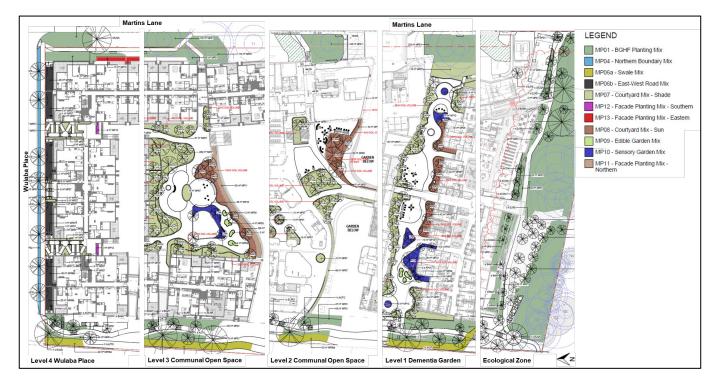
| Proposed landscape layout and planting mix (Base source: Applicant's RRFI)
